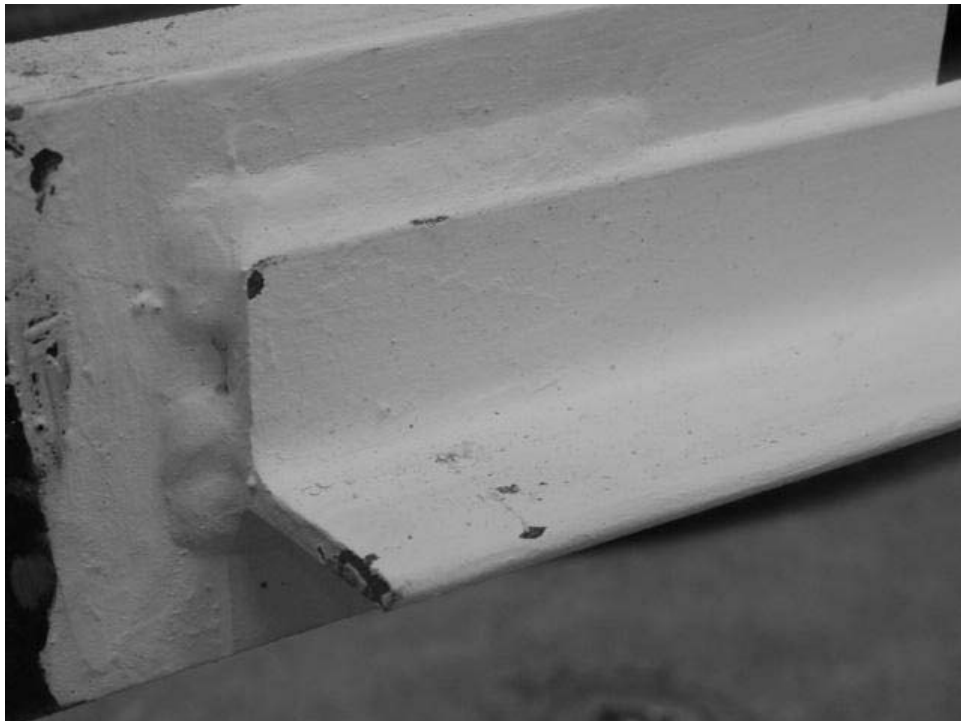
Single angle with balanced welded connection to gusset plate
